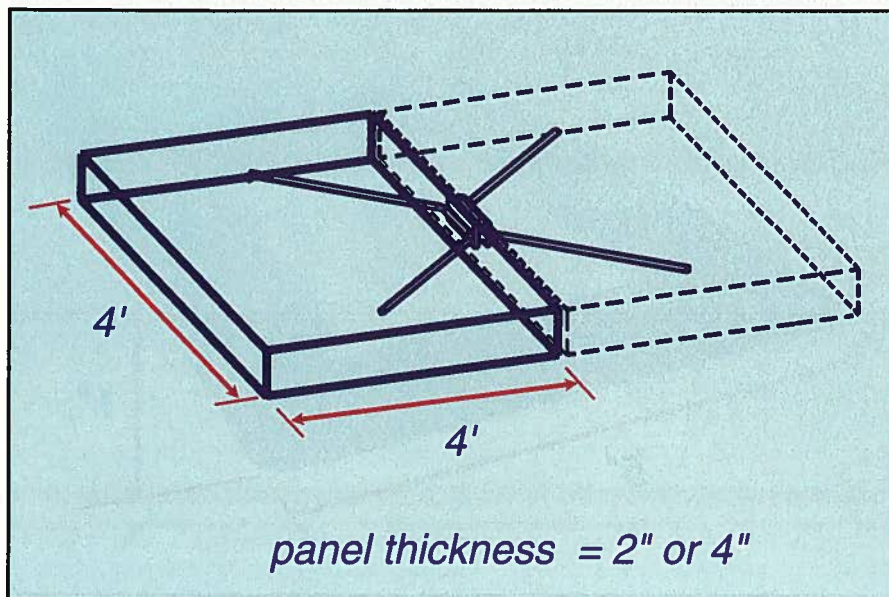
Test specimen dimensions. Note: 1 in. = 25.4 mm.
